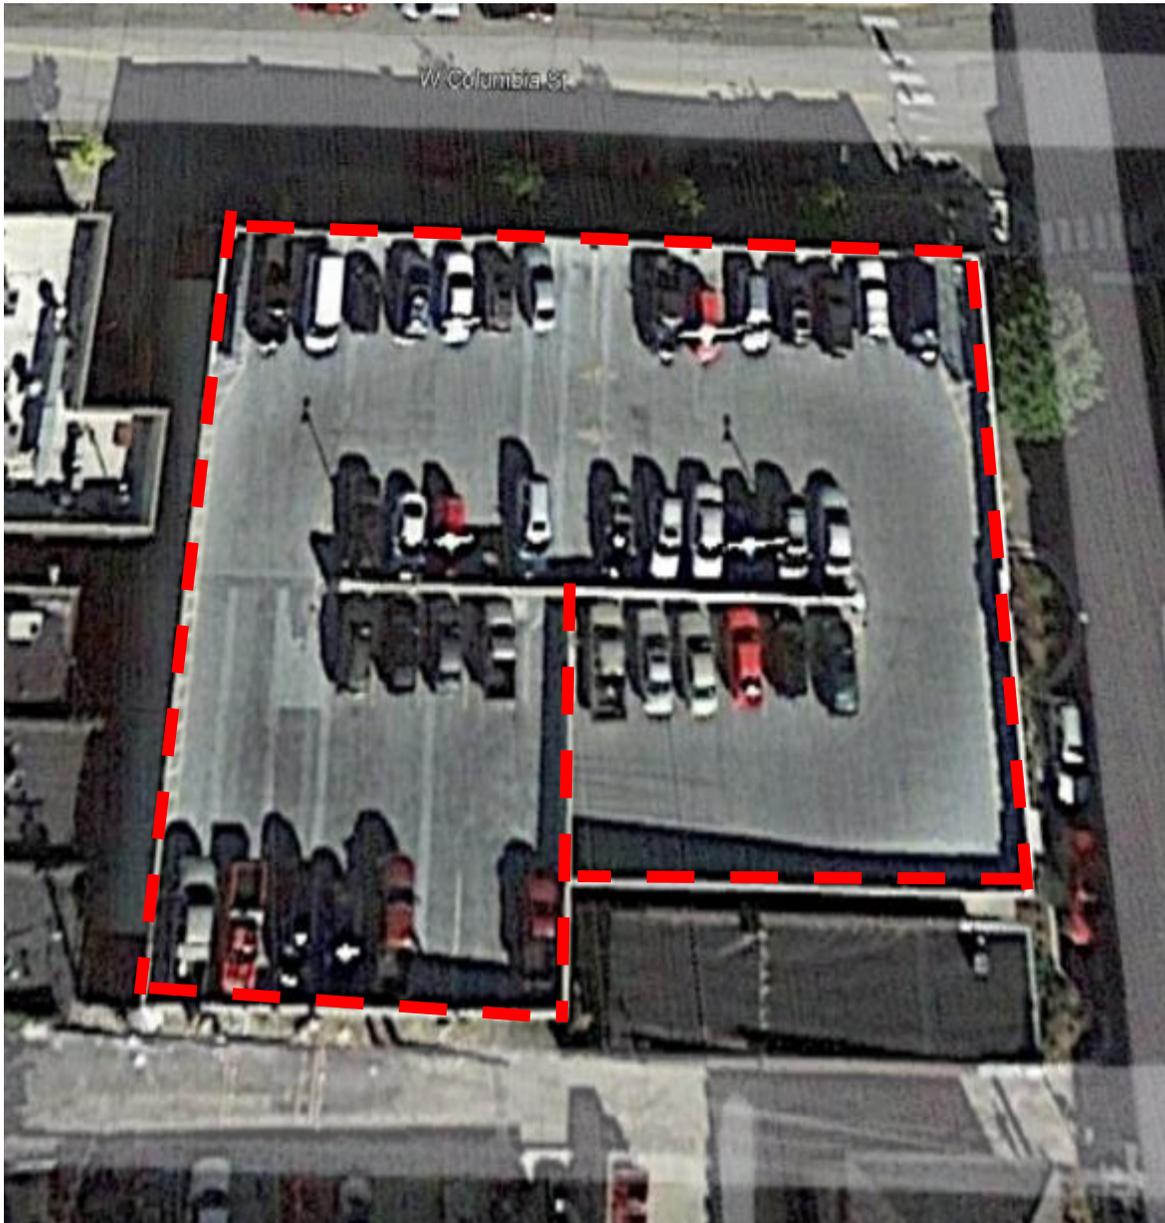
Overhead view of the area we are deck coating and concrete repairs
